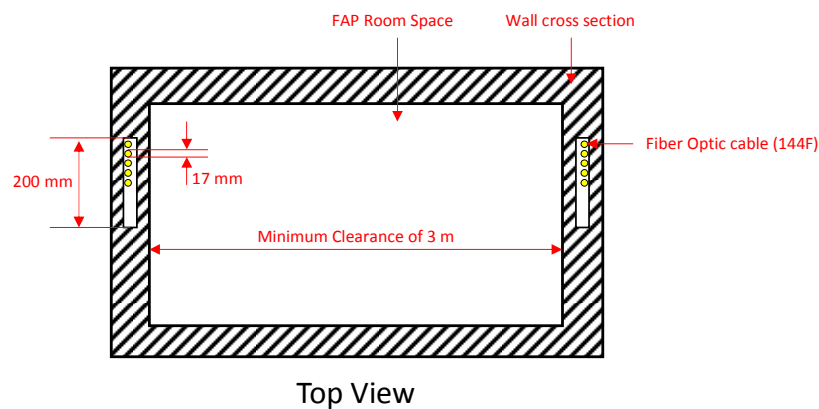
Example 1: Floor Aggregation Point (FAP) room cross section (Top View)
